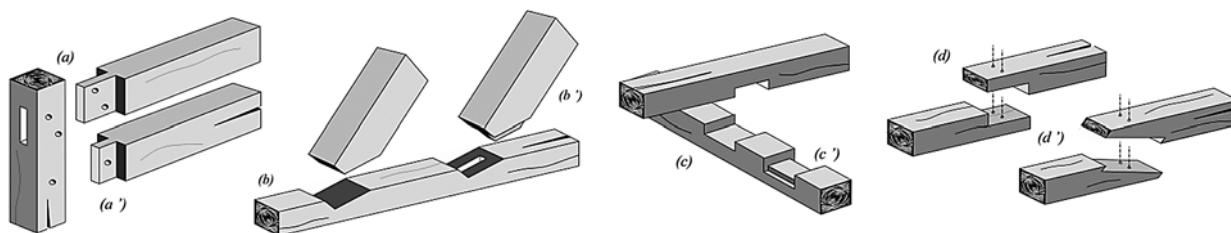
Example of carpentry joints: (a) Through pinned mortise and tenon (a') blind pinned mortise and tenon, (b) Notched joint between main rafters and tie-beam. (b') A skewed tenon may be used to help in keeping all timber pieces co-planar. (c) Half-lap joint. (c') Cogged half-lap joint. (d) Halved-scarf joint (or half-lap splice joint). (d') Scarf joint with under-squinted ends
